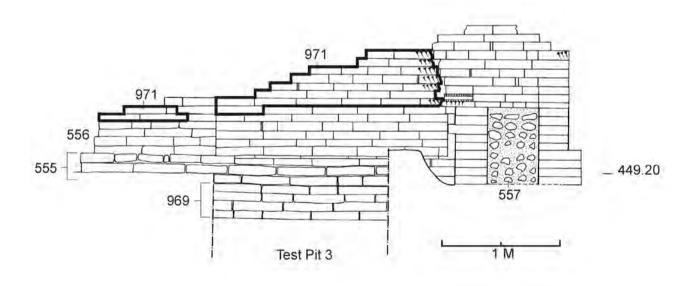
Schematic section/view of the garbhagriha wall of the North Temple looking north showing the extent of later rebuild 971.
